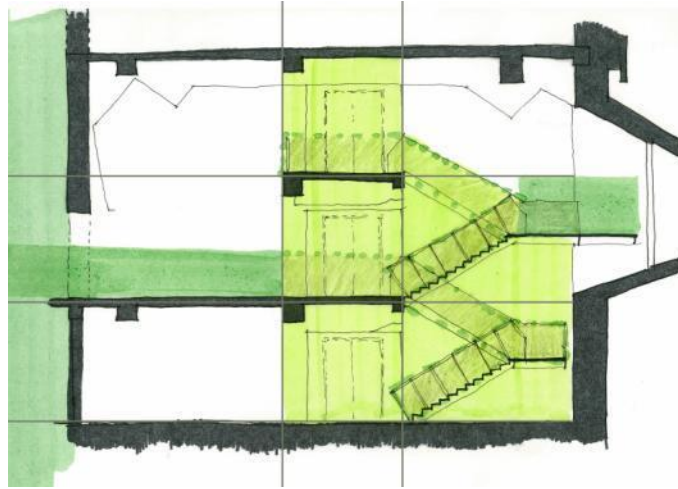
Typical Elevator Lobby, Switch-Stop Stairs, San Francisco Federal Building
